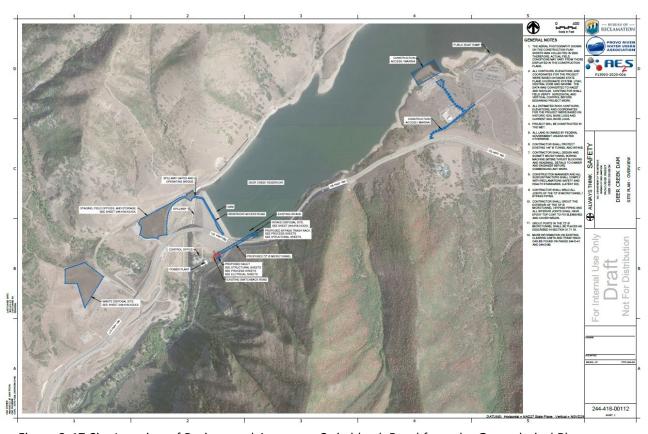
Site Location of Borings and Access, or Switchback Road from the Geotechnical Phase
